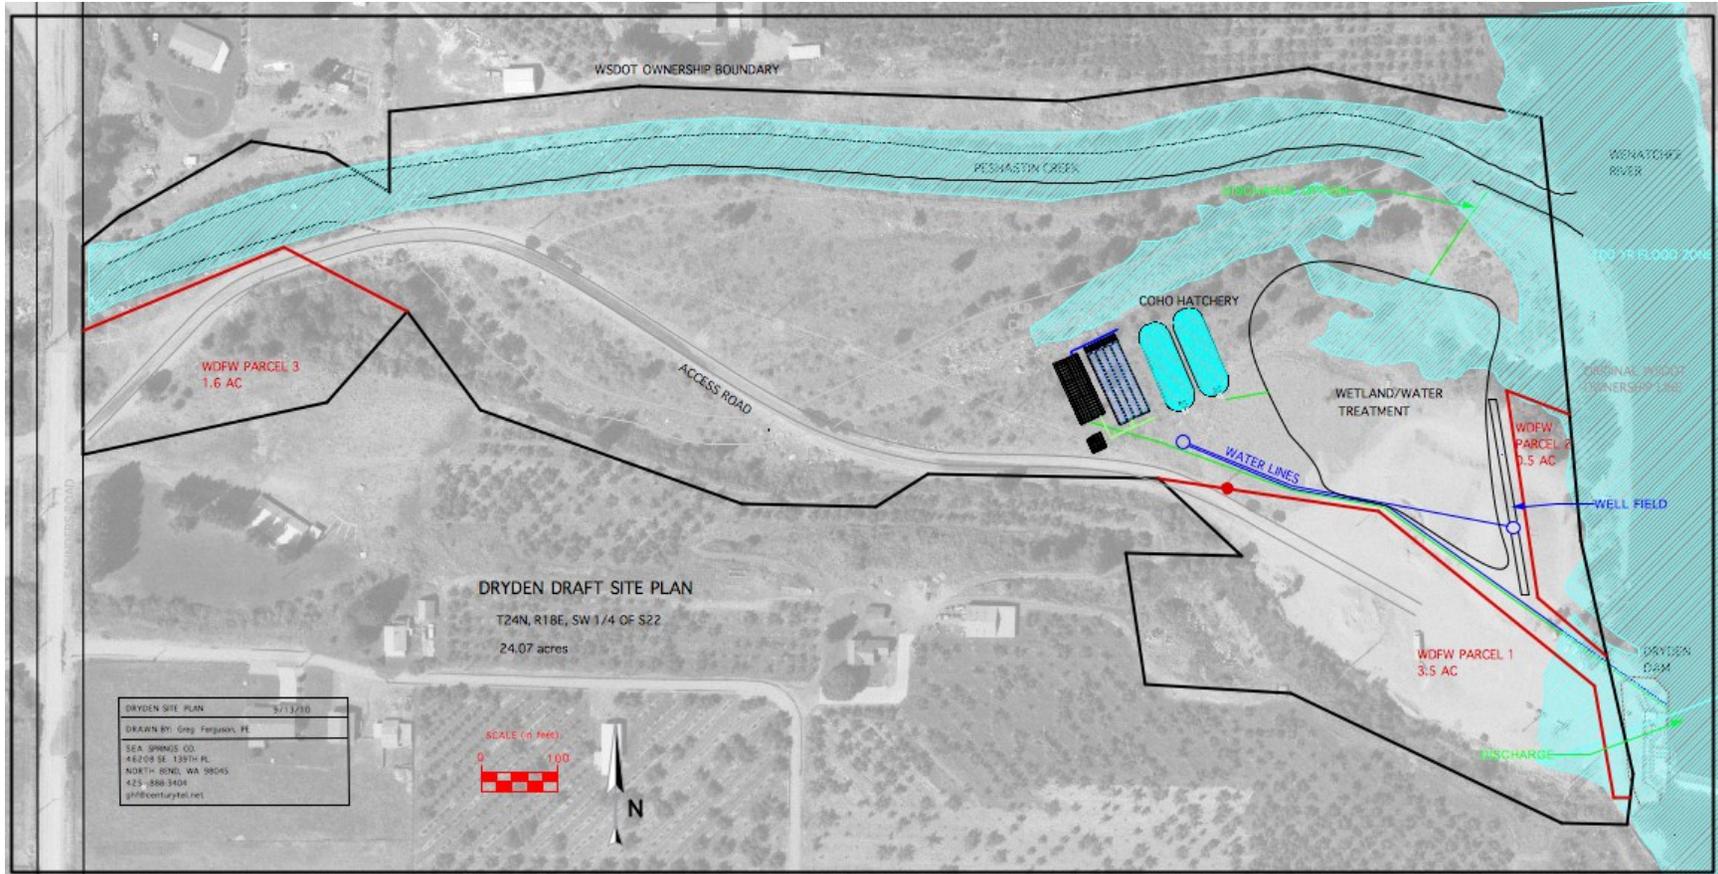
Proposed Dryden Hatchery: Draft Site Plan with Flood Boundaries
